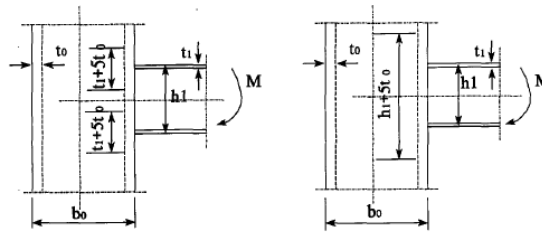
Chord side wall failure (Lu 1997).
